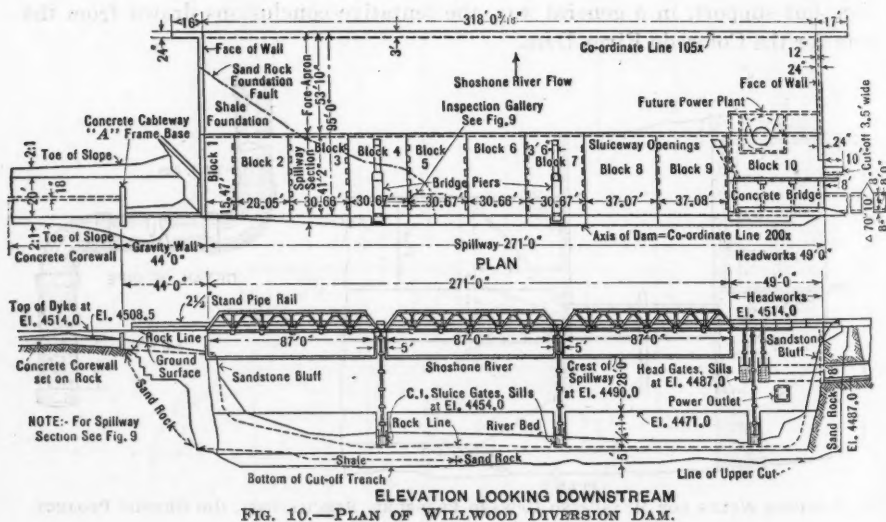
PLAN OF WILLWOOD DIVERSION DAM.
